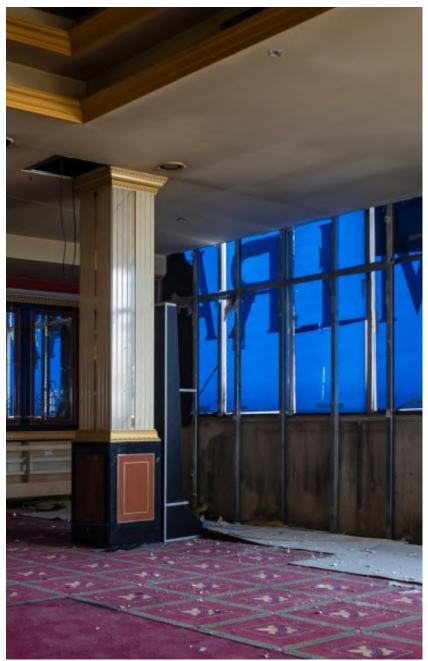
Cepelia pavilion, Interior, 1st floor, 2018, photo: Wojtek Radwański
